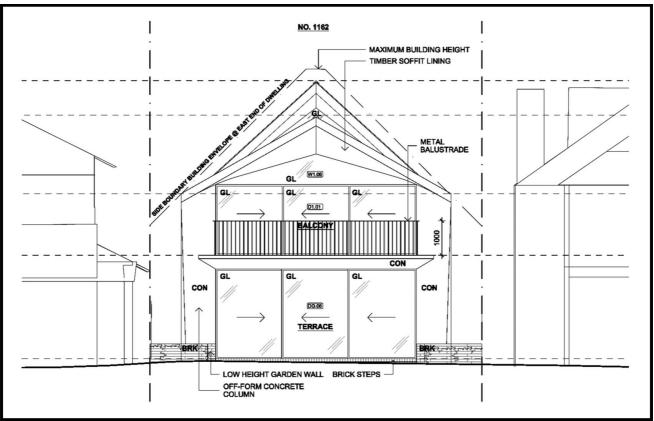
East elevation of proposed design – from Complete Thought Studio
